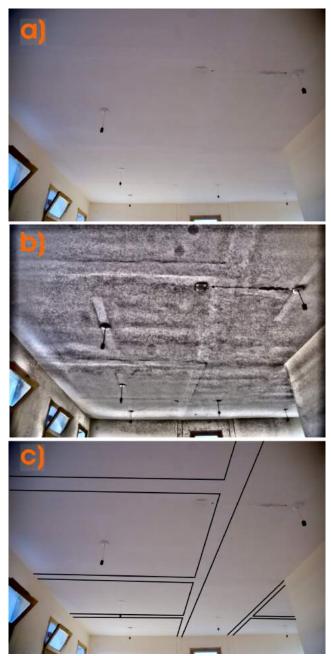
(a)Photo of the ceiling of the main room, facing the northern side. (b) The same picture, with local contrast highlighs. The original position of the walls can be seen, as well as lamps hanging from electrical boxes, and marks left by tube fixtures. (c) The original picture, plus the ceiling lines that were observed though contrast imaging in picture (b).
